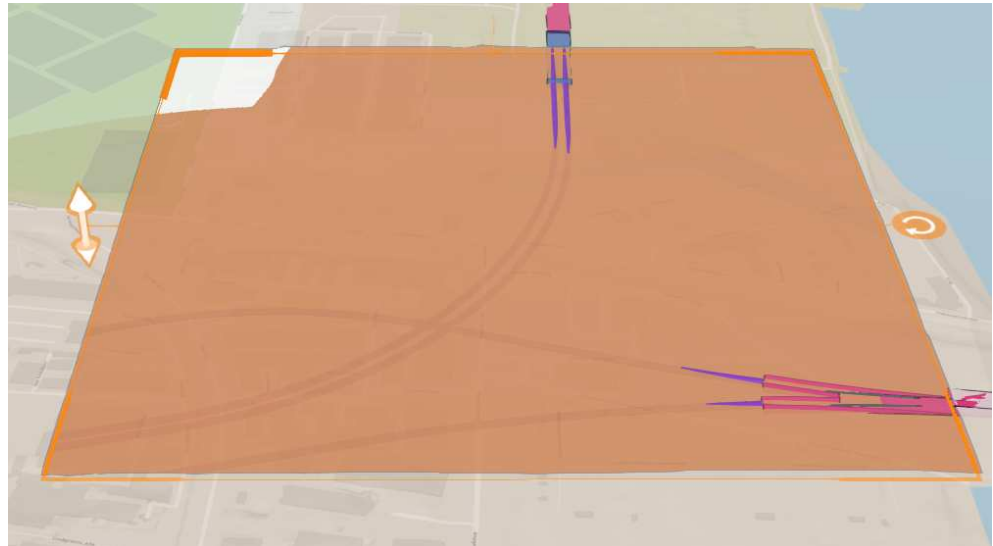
Limestone levels and tunnels without Øresund metro connections.
